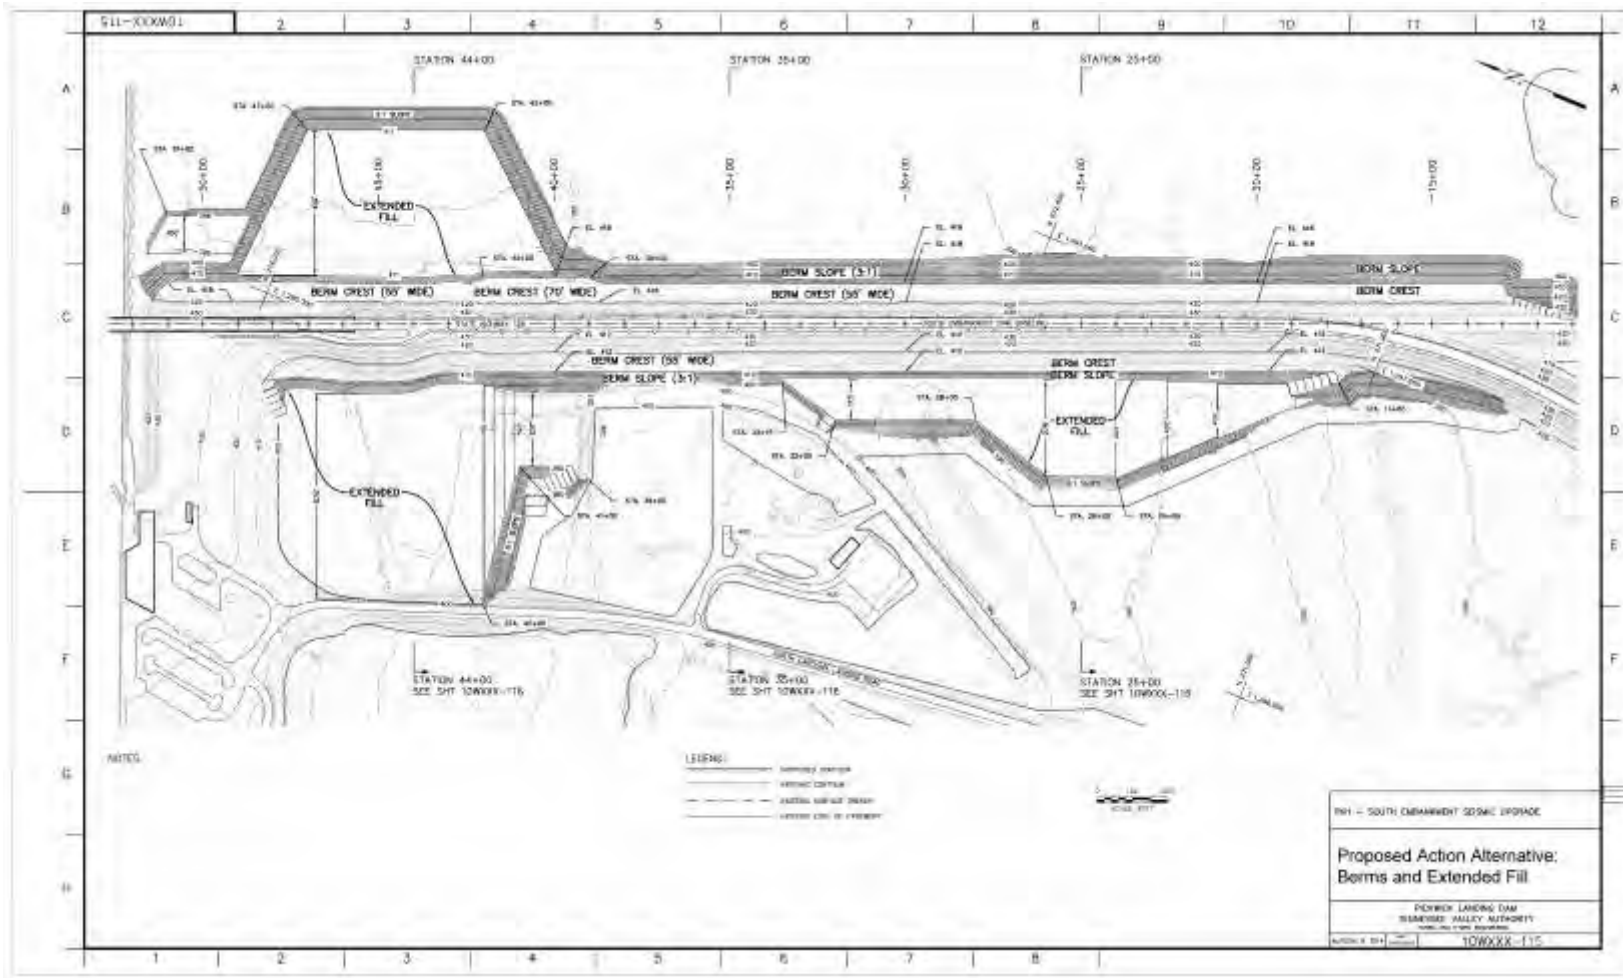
Proposed Action Alternative - Berms and Extended Fill
